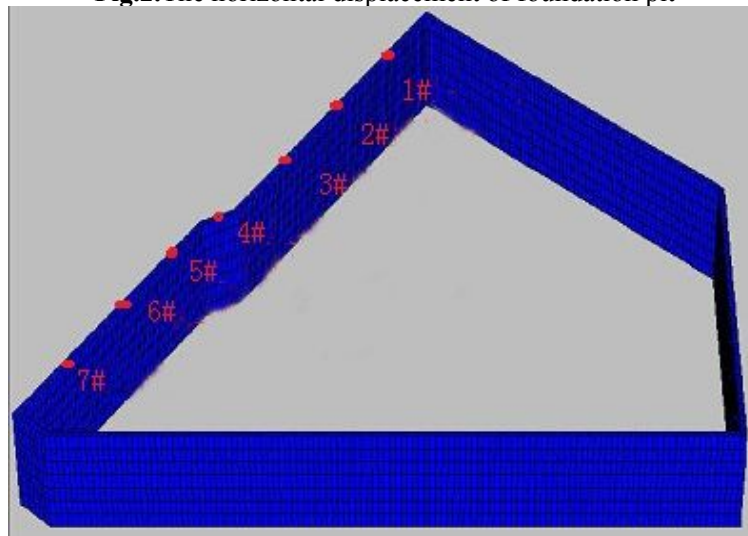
The Monitoring points arrangement of horizontal displacement of foundation pit
